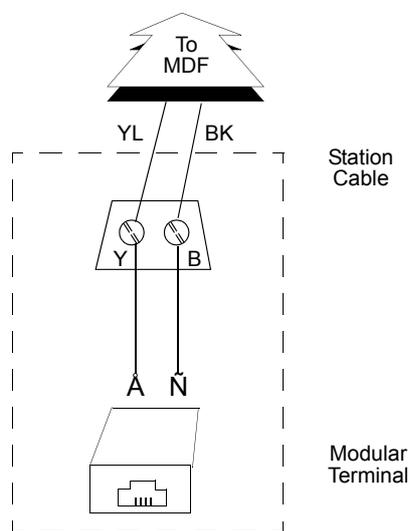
Modular Terminal Connections for Multiline Terminals & Attendant Add-On Consoles
